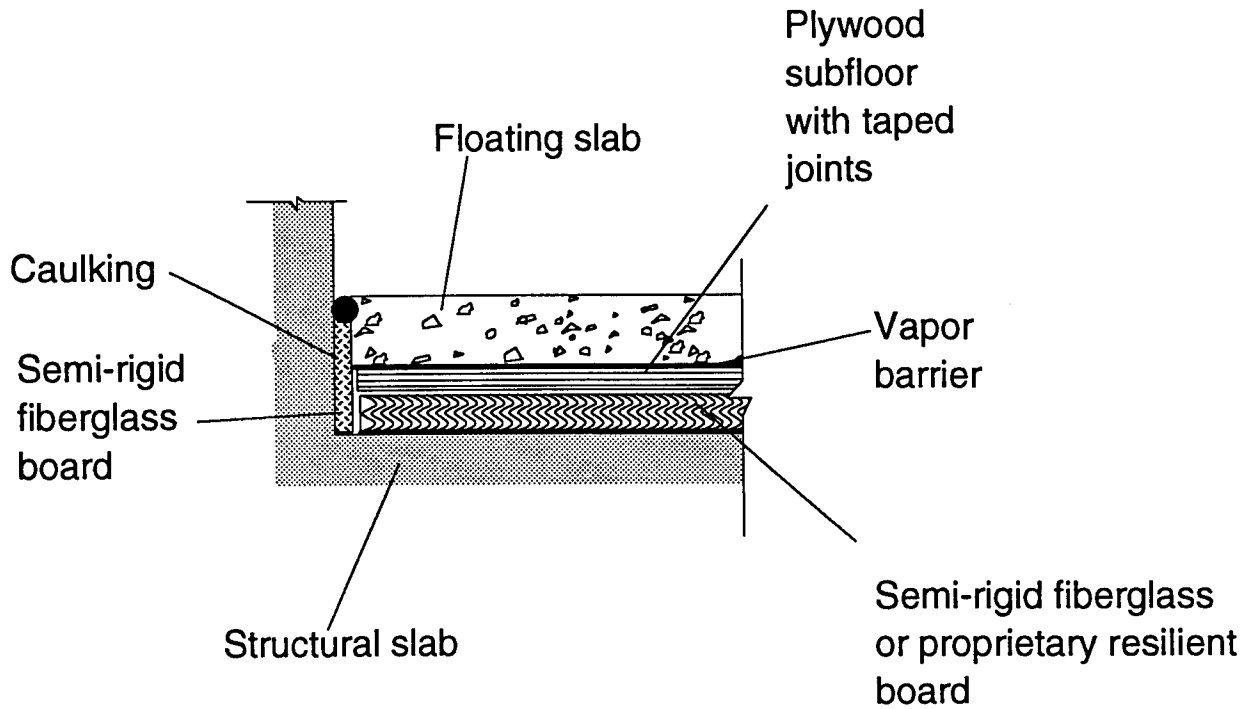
Example of concrete floating floor supported on a resilient mat. The floating slab should not be in contact with the main building structure nor the structural slab below.
